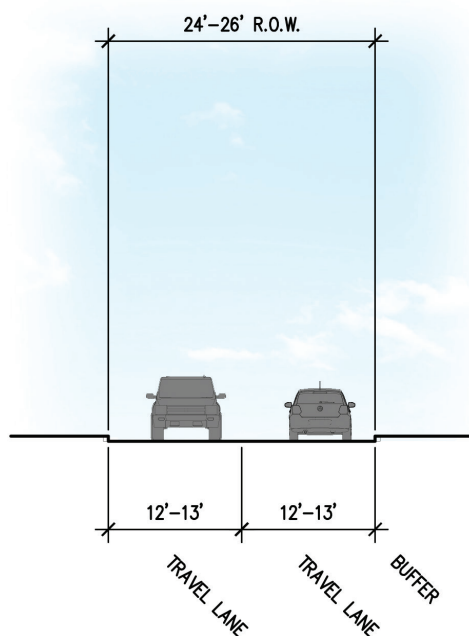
TYPICAL CROSS SECTION OF RESIDENTIAL LOCAL STREET
